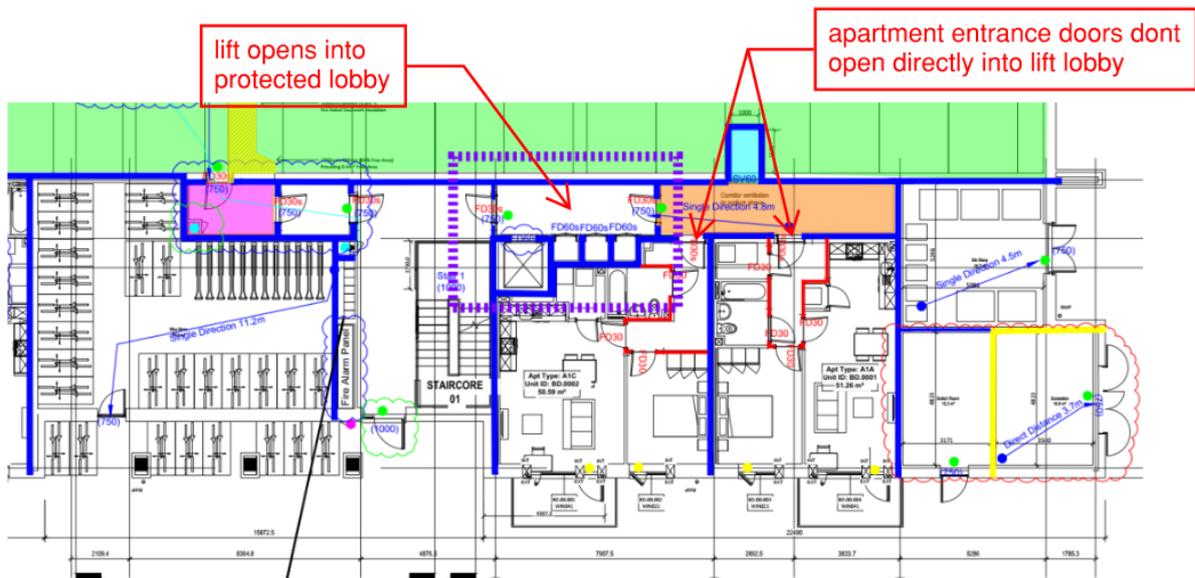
Block D, ground floor plan – lift accessed via lift lobby with no apartments opening into same
